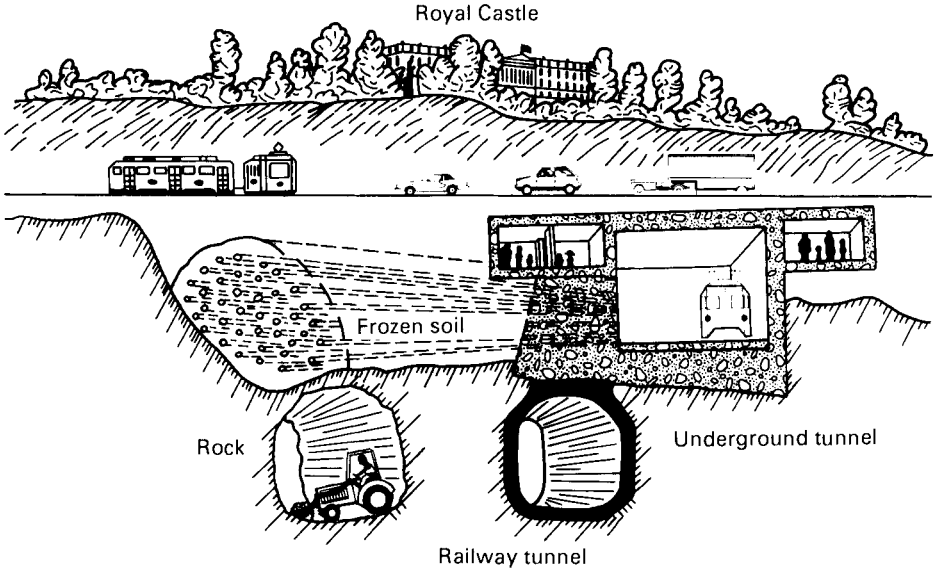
Ground freezing in the Oslo railway tunnel (after Jøsang[9])
